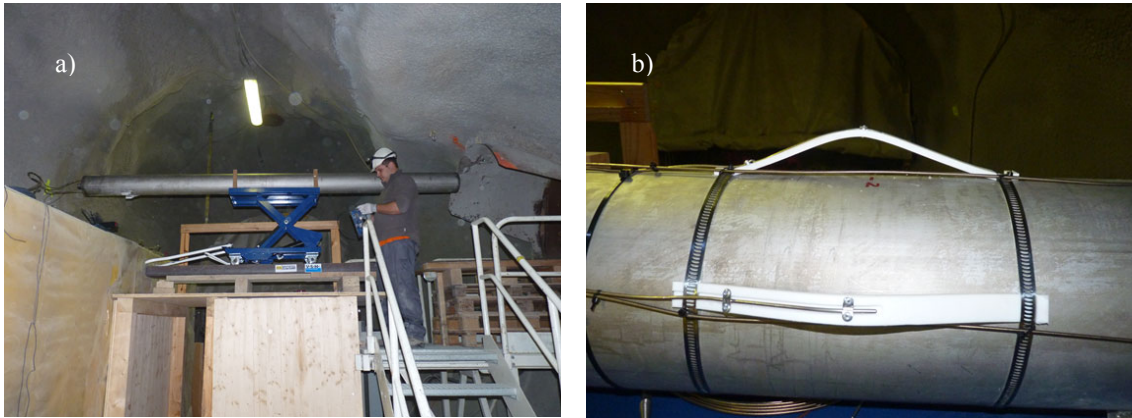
a) Heater 2 on the MI niche platform; b) detail of the thermocouples positioning pieces.
